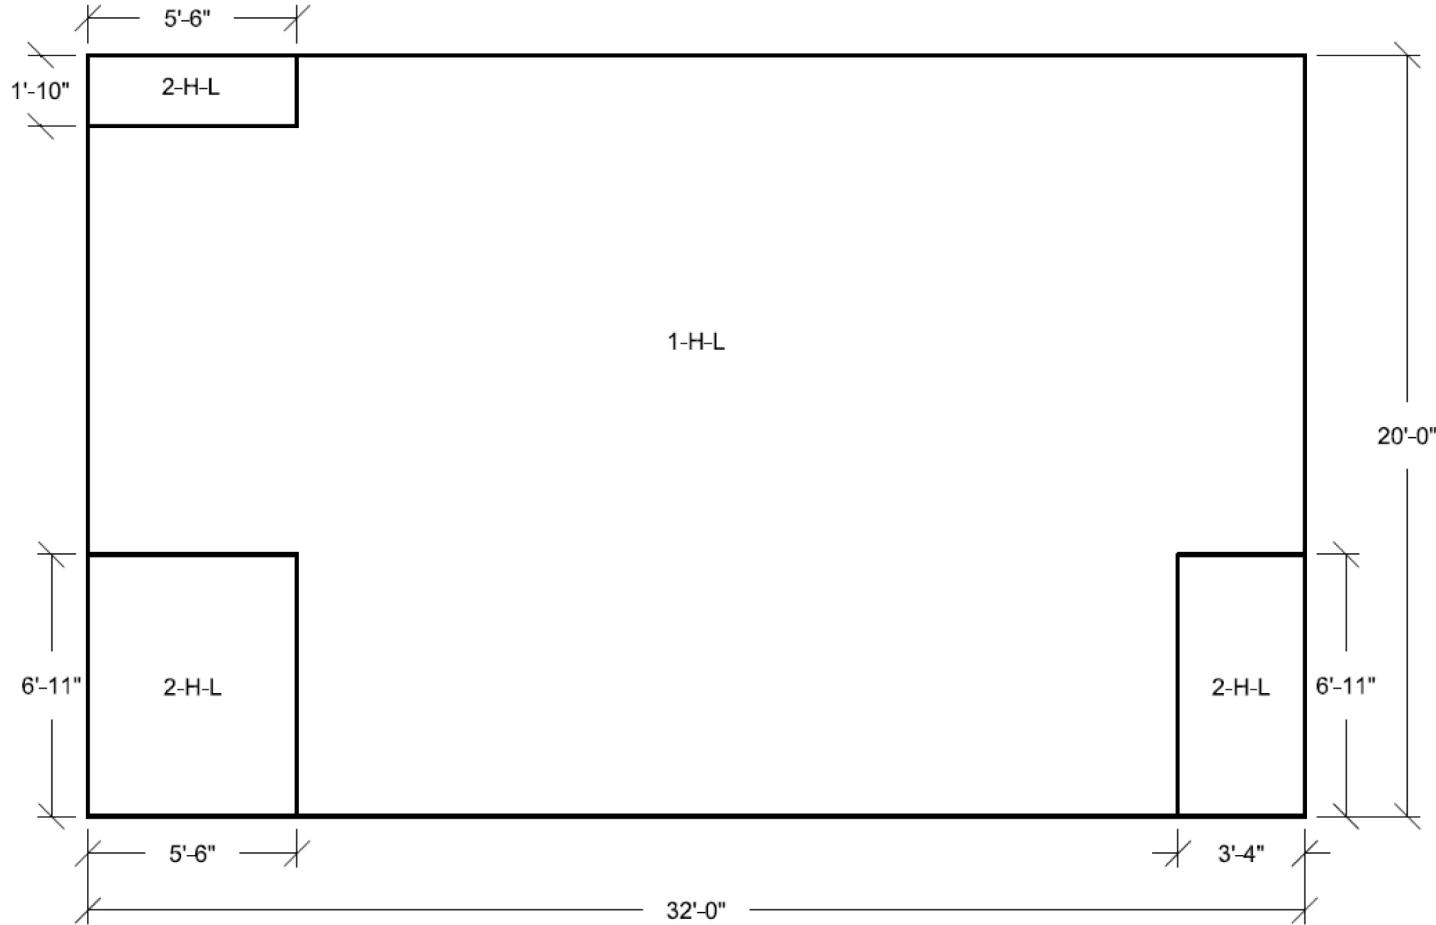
H.6-194 DGFOSV Wall 13 Looking From Outside
